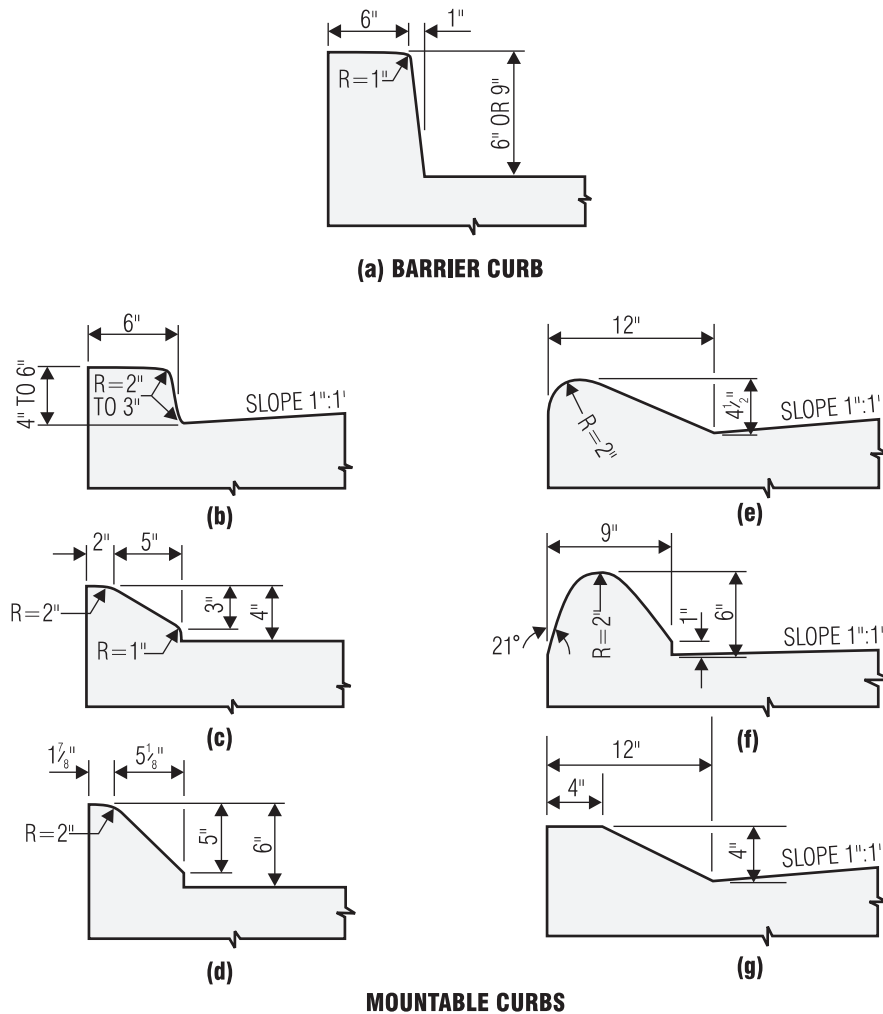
Typical highway curbs. (a) Barrier curb used to prevent vehicles from leaving the roadway. (b) to (g) Mountable curbs that permit vehicles to cross when necessary. Slopes of curb faces and rounding vary.
